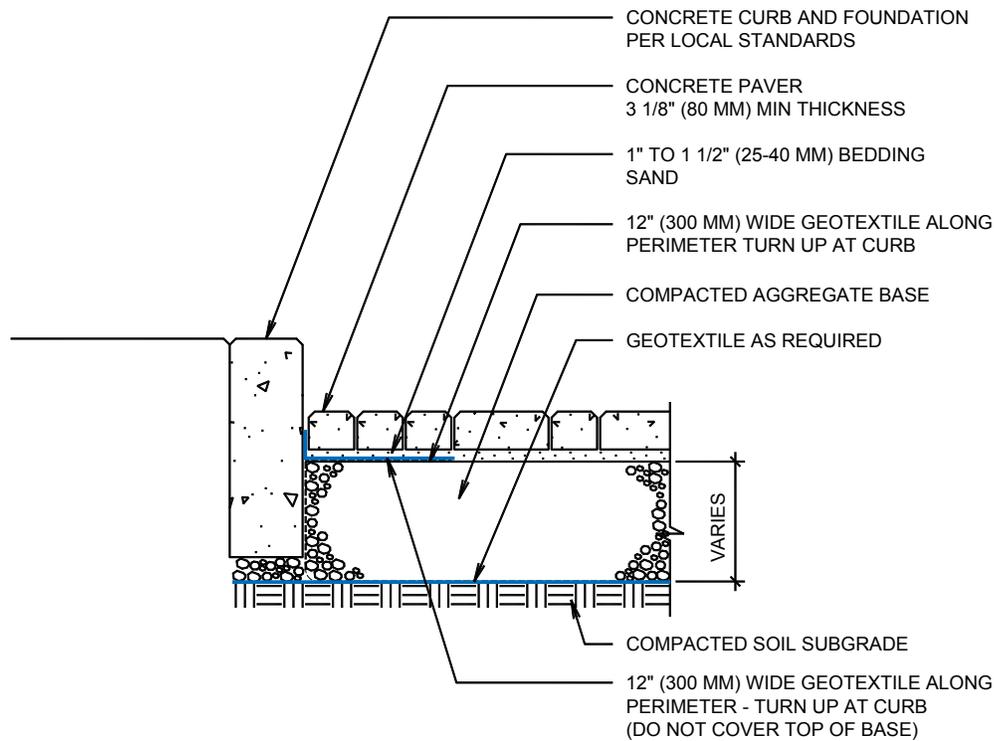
Geotextile in an interlocking concrete pavement over a flexible base
